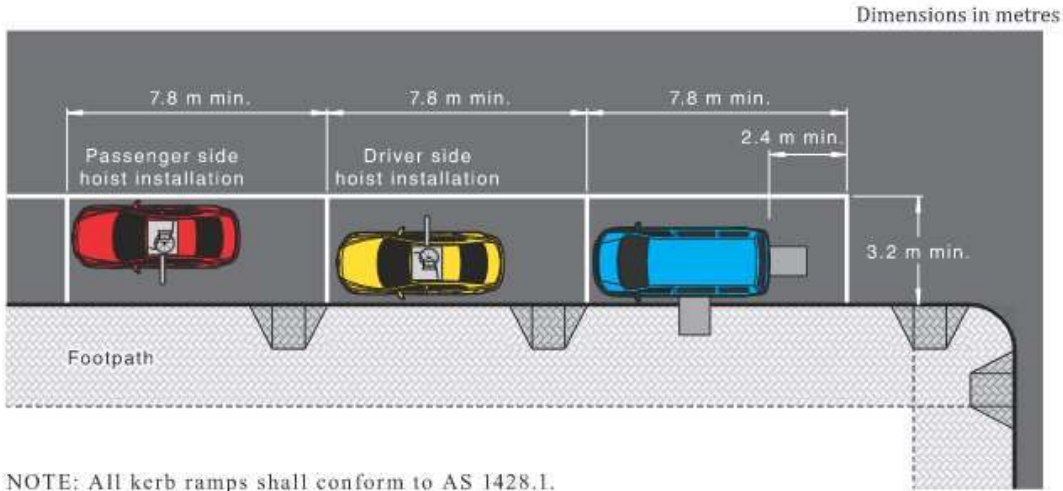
Examples of accessible parallel parking without kerb extensions
